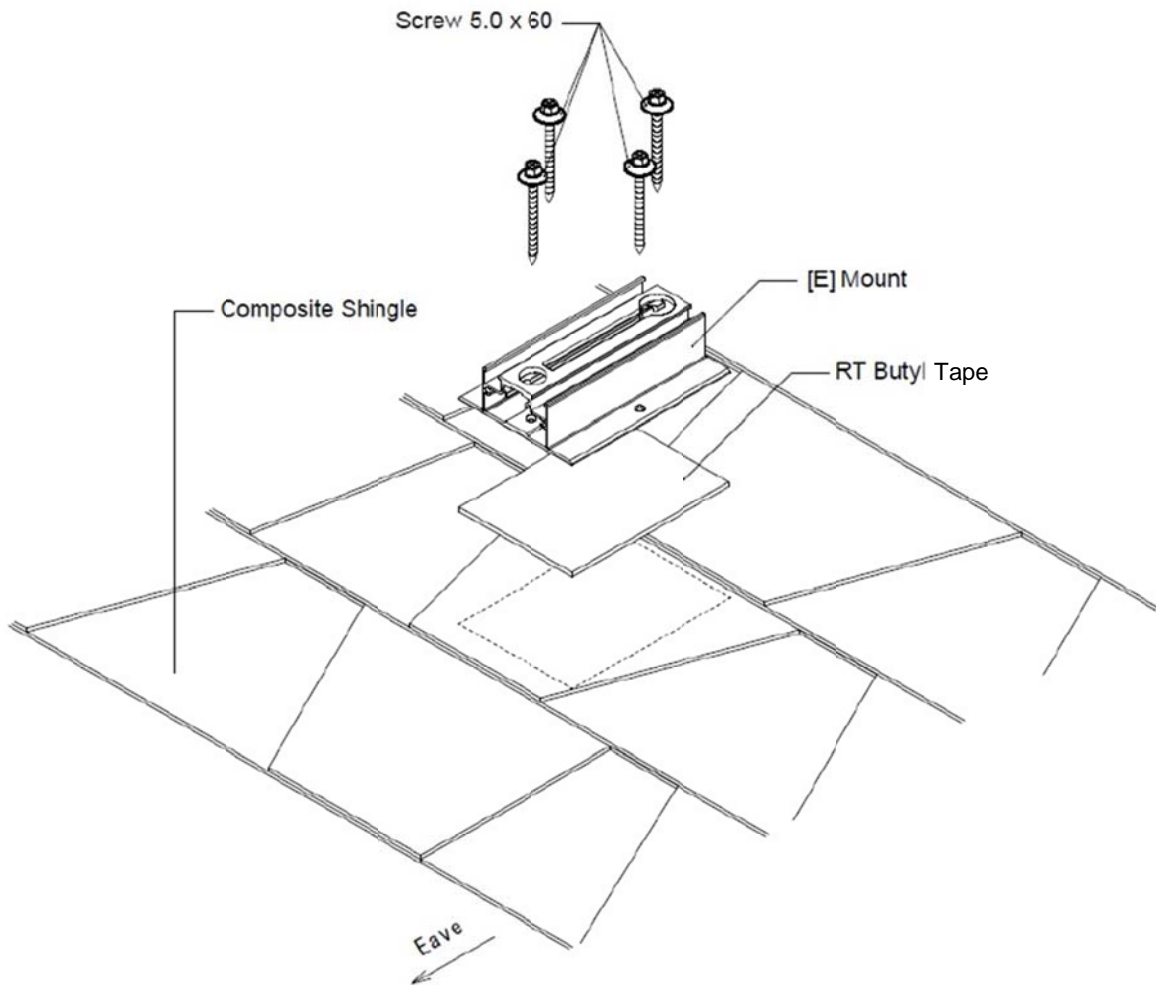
[E] MOUNT SOLAR PV MOUNTING BRACKET ASSEMBLY
